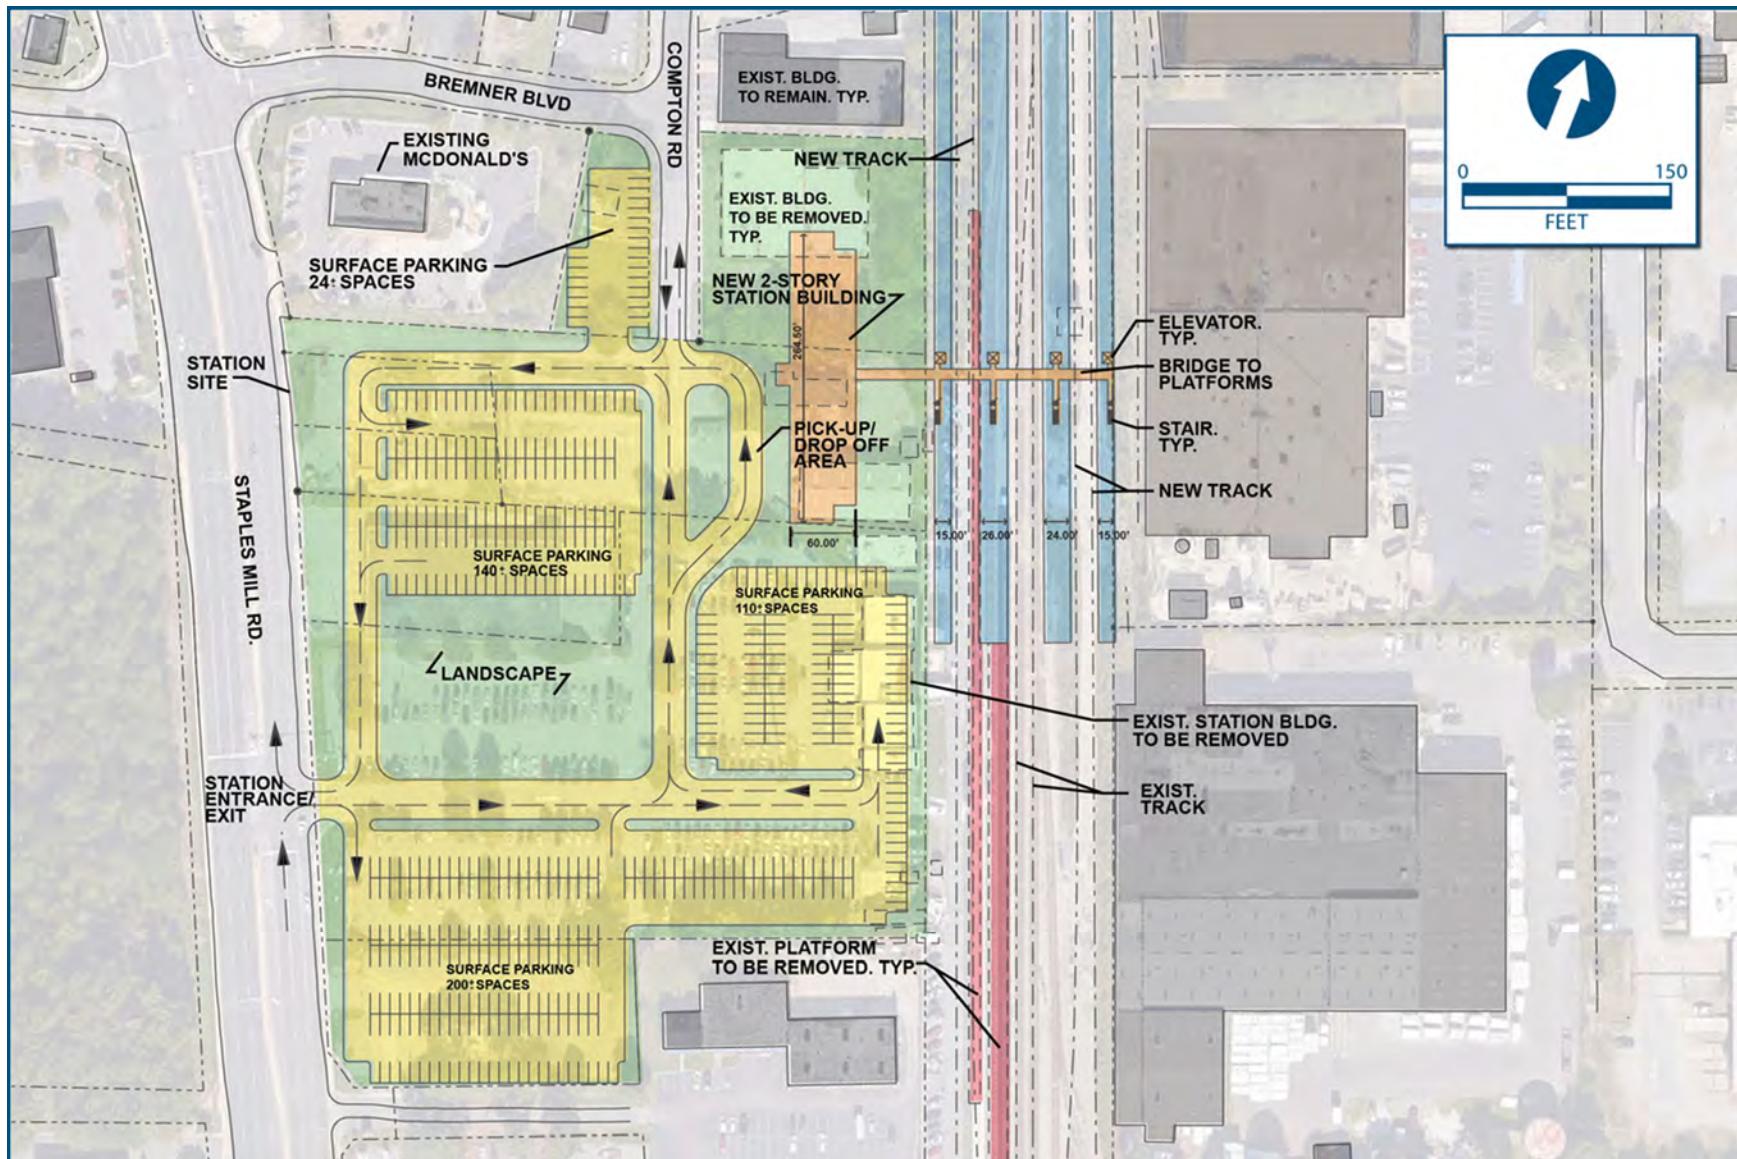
Staples Mill Road Station Improvements for Build Alternative 6G
